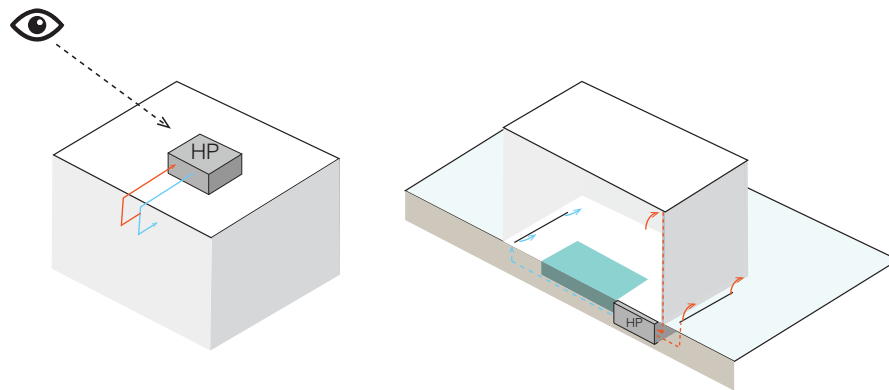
Design implication of the heat pumps. Left: visible heat pump on roof. Right: Hidden heat pump combined with good detailing in an early design phase. The inlet and outlet of the system are integrated into the floors and walls of the building.
